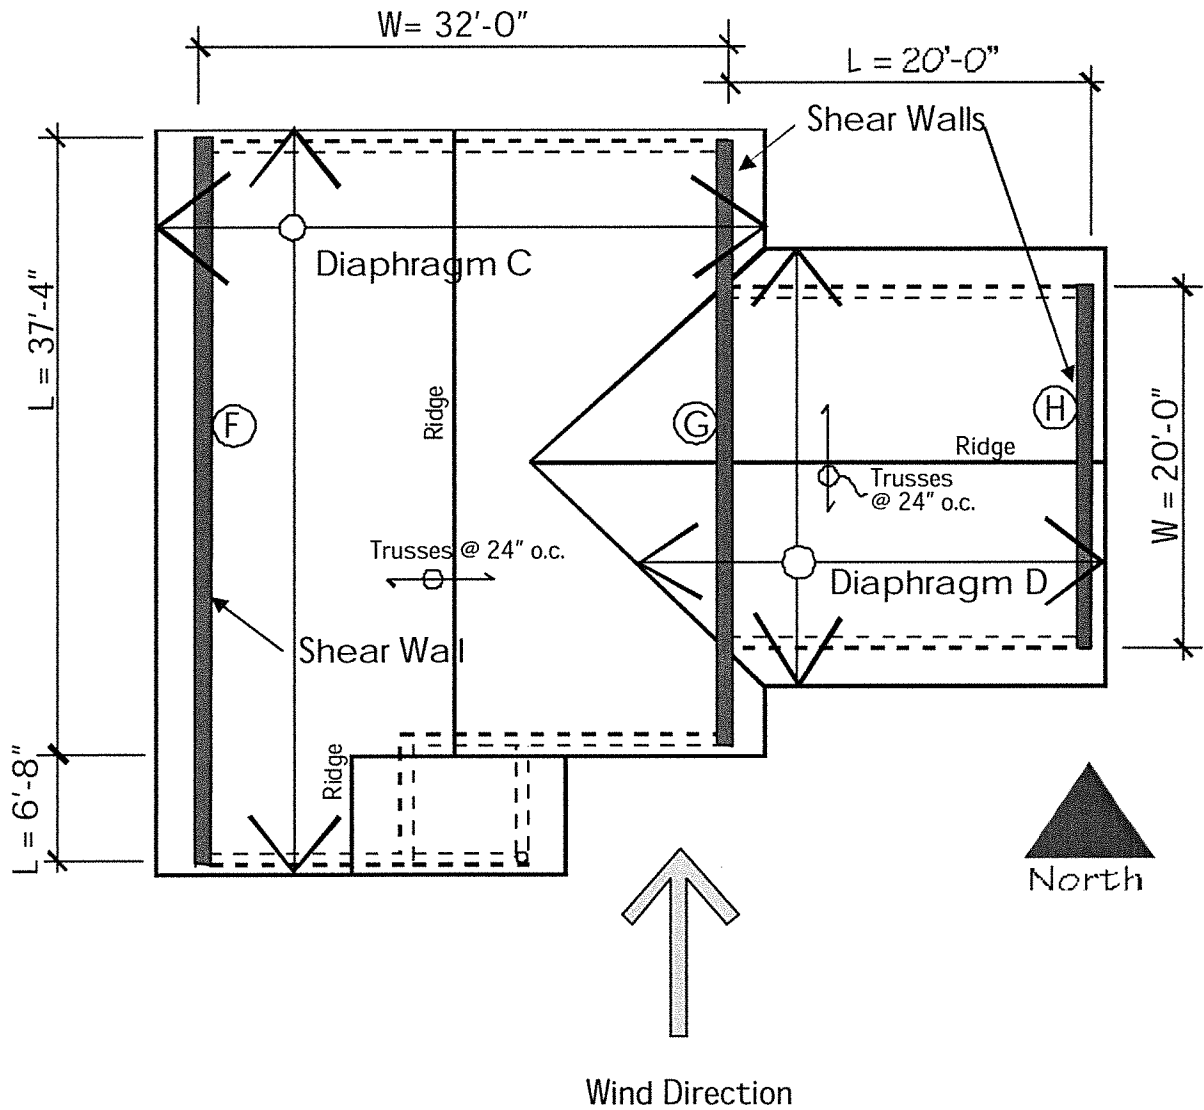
North/South Direction for Roof Diaphragms and Shear Walls
